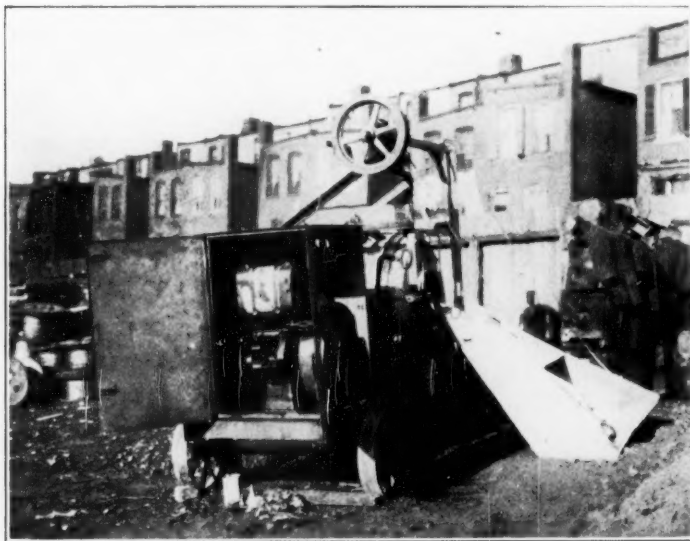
Concrete Mixer Adapted to Meet Telephone Construction Requirement
